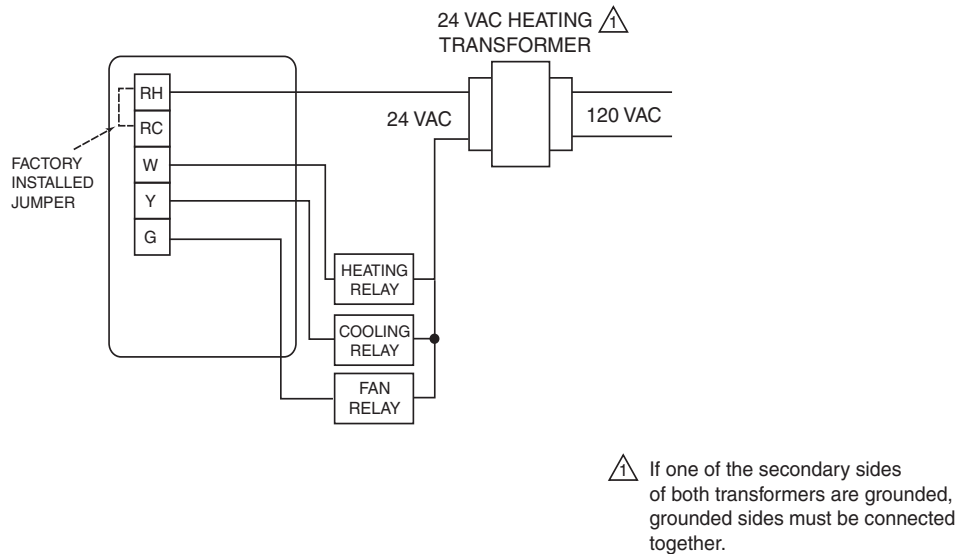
Typical T205 Wiring to Heating/Cooling System With Single Transformer.
